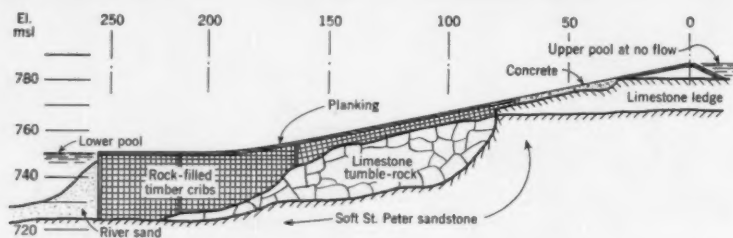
Timber apron was constructed in 1870 to prevent further undercutting of limestone ledge at St. Anthony Falls. This apron was about 200 ft long from crest to sill, and rested on rock-filled timber cribs and limestone tumble-rock. It was severely damaged by 1952 floods.
